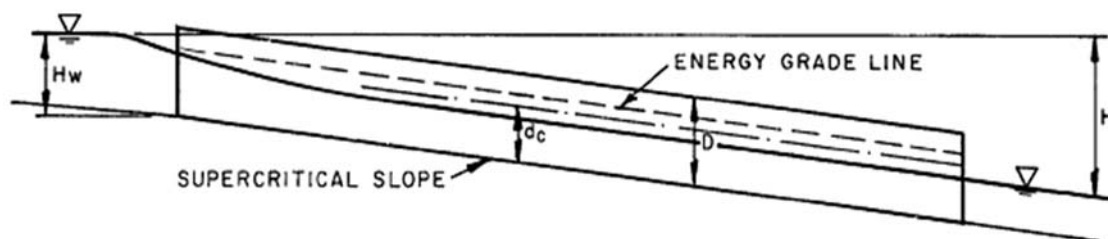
Inlet Control – Unsubmerged Inlet (UDFCD, 2016).
